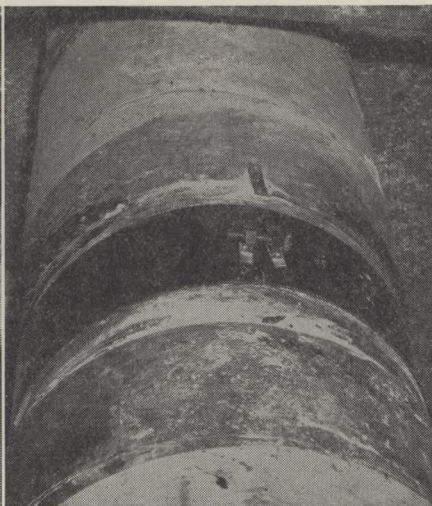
Conduit Connector Band in Position for Welding
